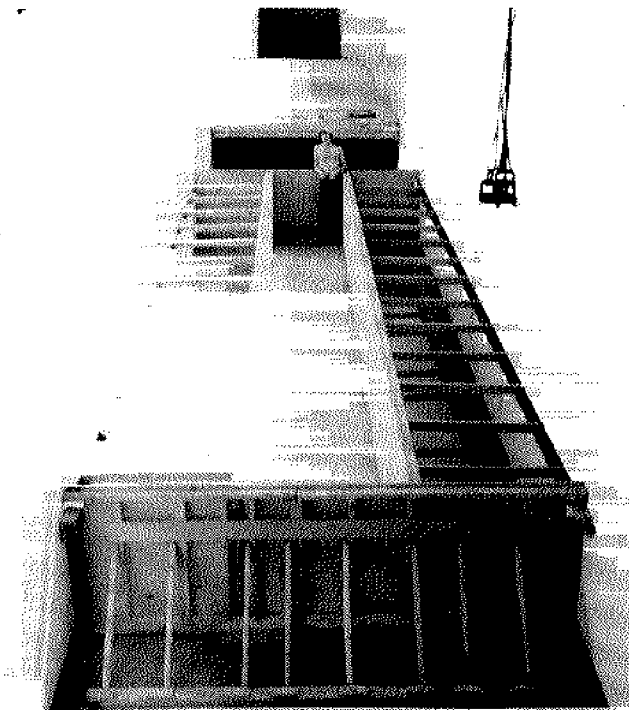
In place photograph of the test section before the addition of the soil layers.
